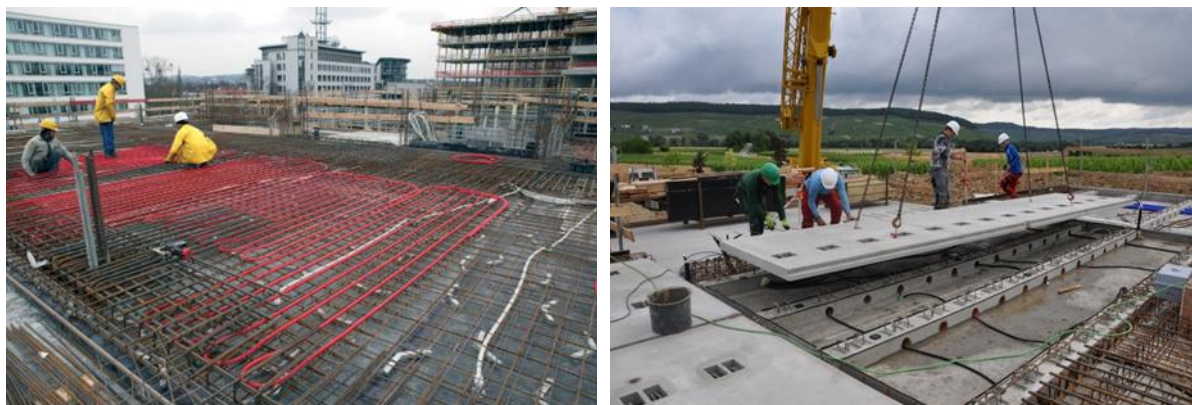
Installation of the pipe registers in the central position of the solid cross-section in a cast-in-place concrete ceiling (left) and Flat slab with sandwich cross-section, separate upper and lower slabs with a cavity (right). Source: Innogration GmbH
